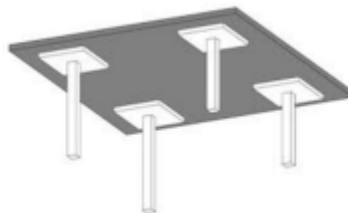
Typical shape of Reinforced Concrete Flat Slab with drop panel
